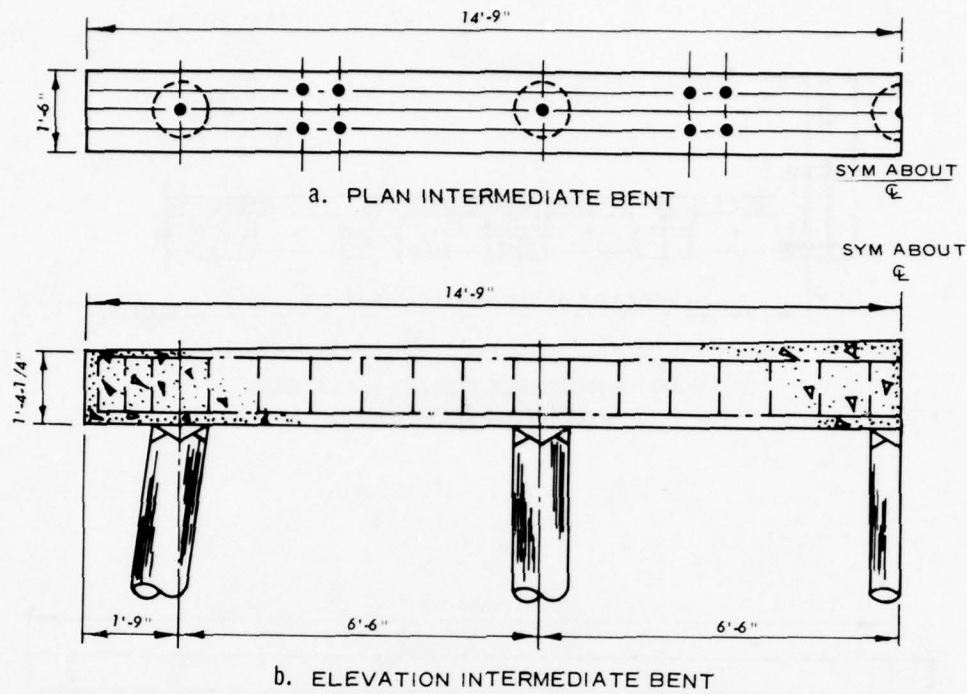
Precast pile cap for 19-ft span of reinforced concrete
